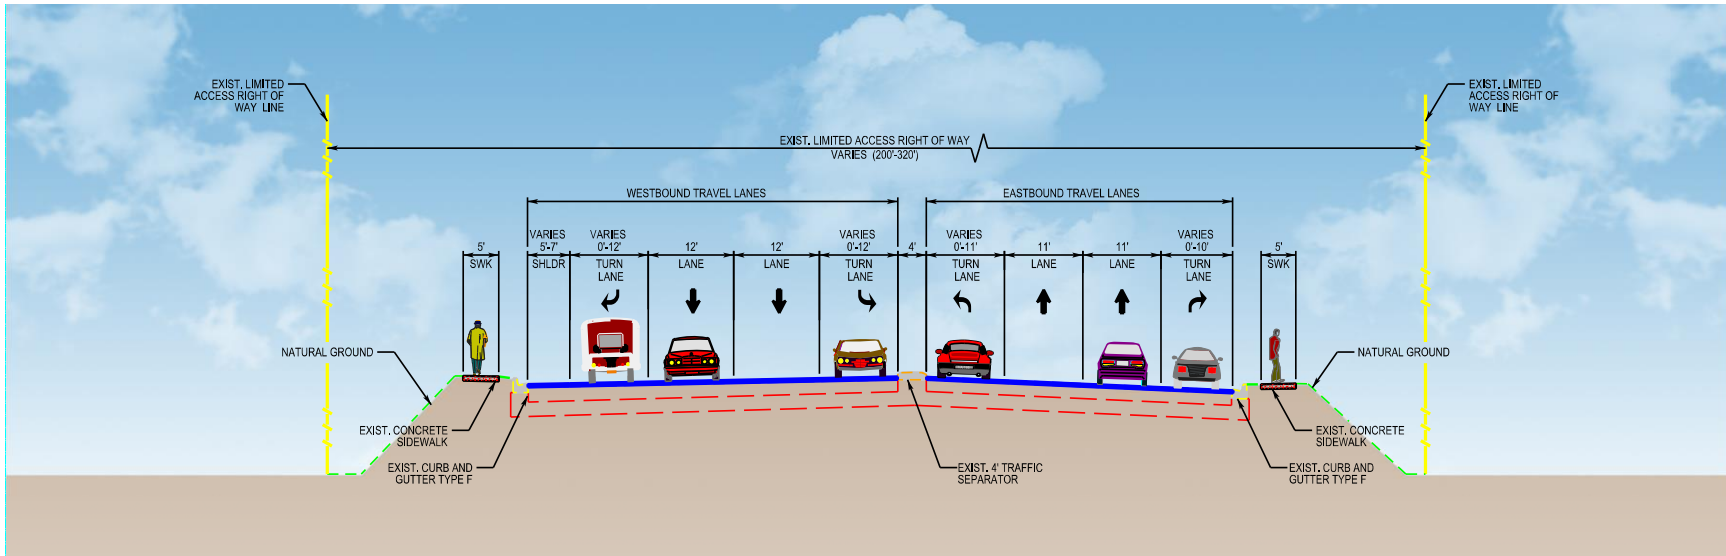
Lantana Road from SR 9/ I-95 to Shopping Center Drive
